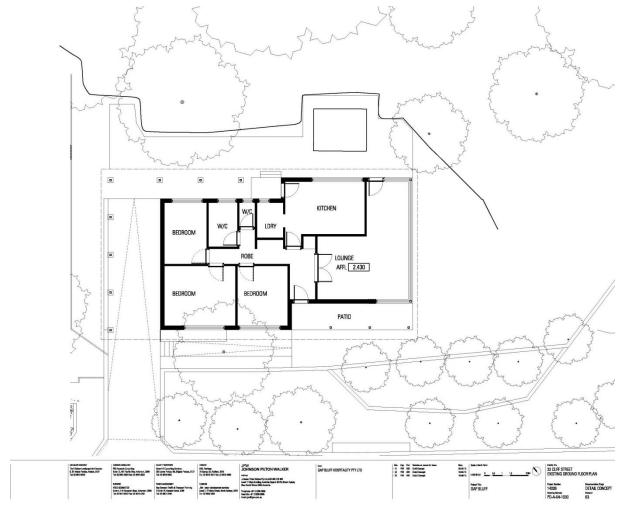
Floor plan, 33 Cliff Street. (Source: JPW 2015)
